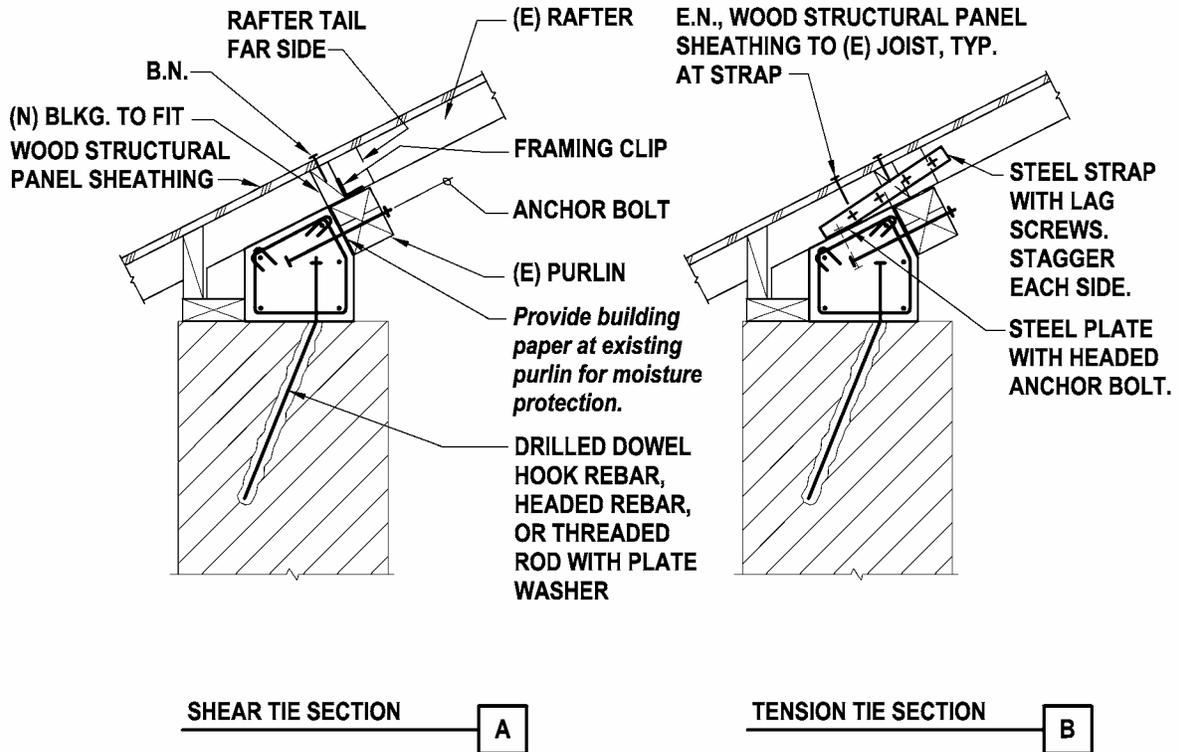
Bond Beam at a Sloping Roof
